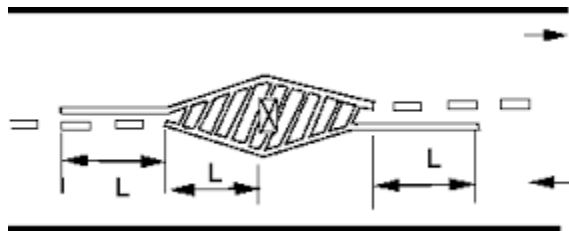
OBSTRUCTION APPROACH ON ROAD
